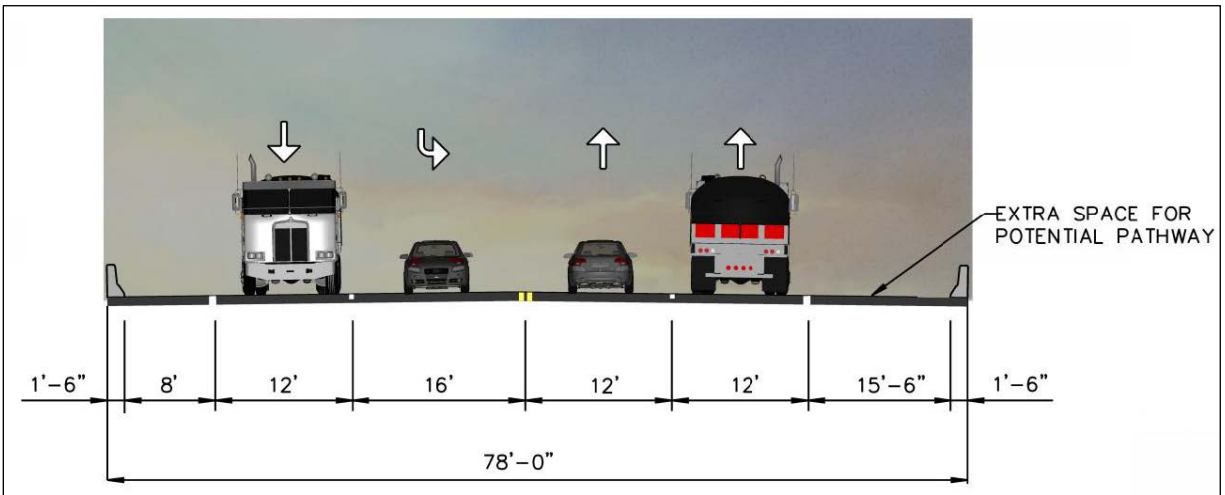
G South Alternative, new Kenai River Bridge cross section
